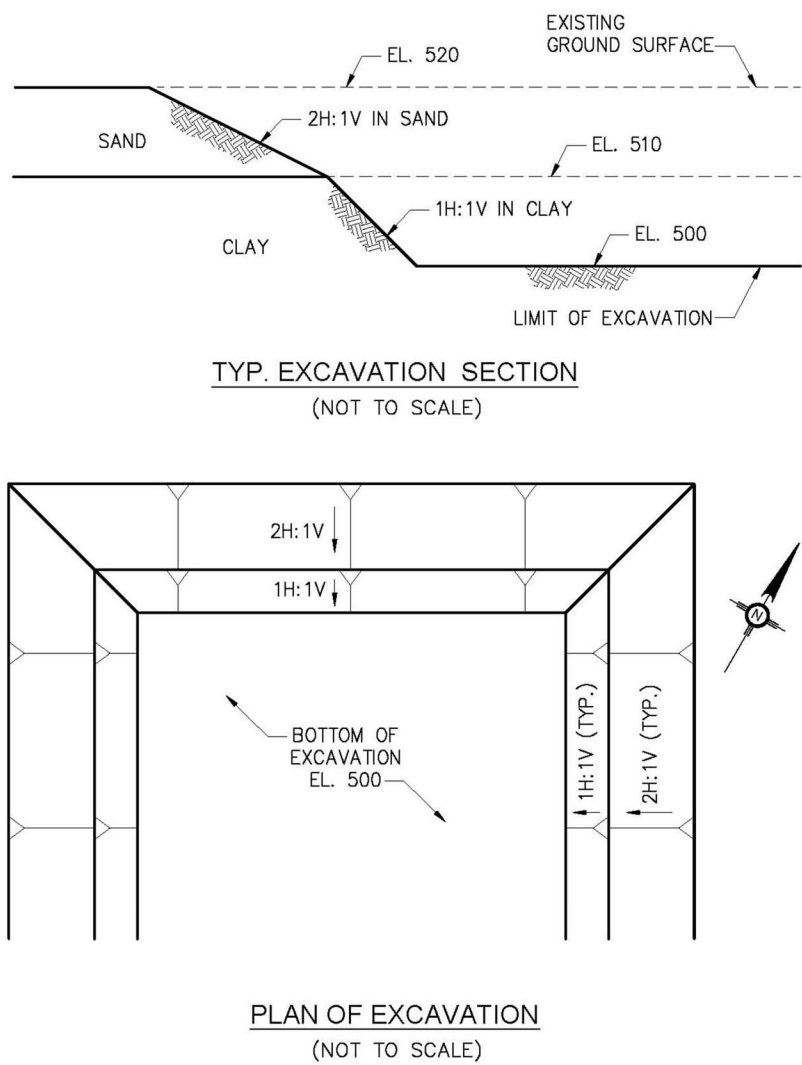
P-2. Plan and Section of Excavation in Sand and Clay
